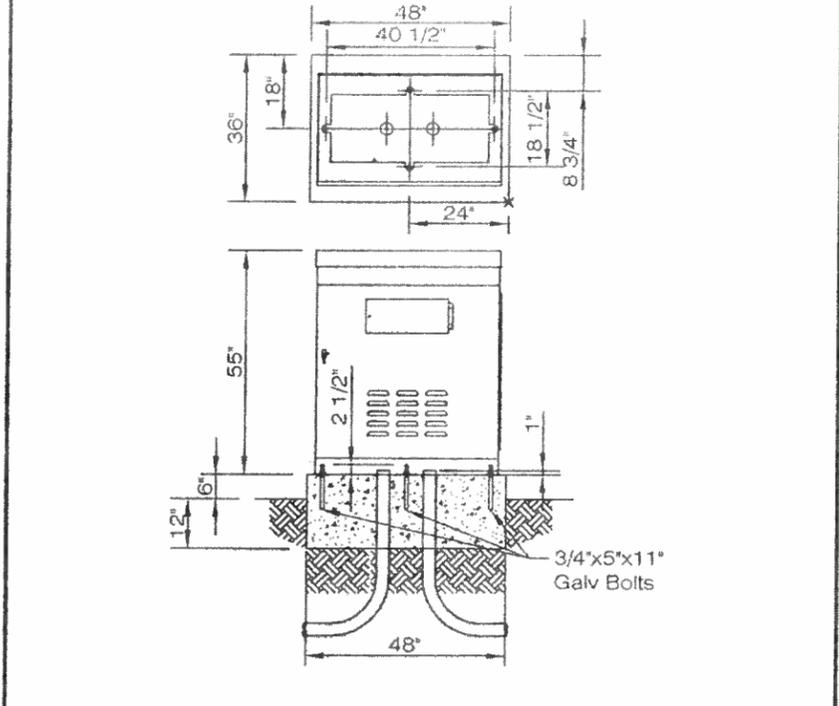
FOUNDATION - BASE MOUNT MI CABINET
